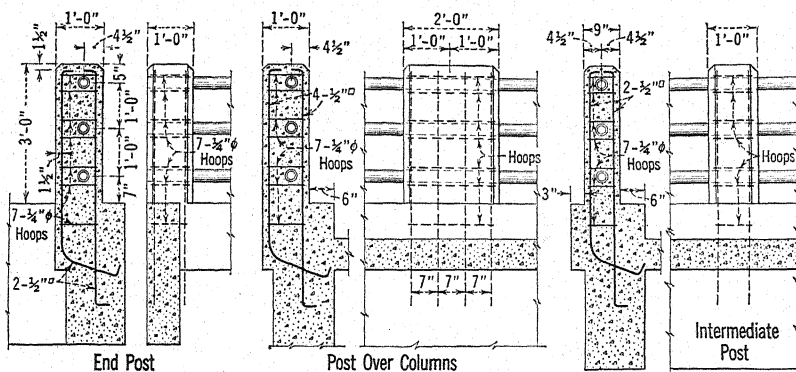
Pipe Railing, Concrete Posts. (See p. 390.)
